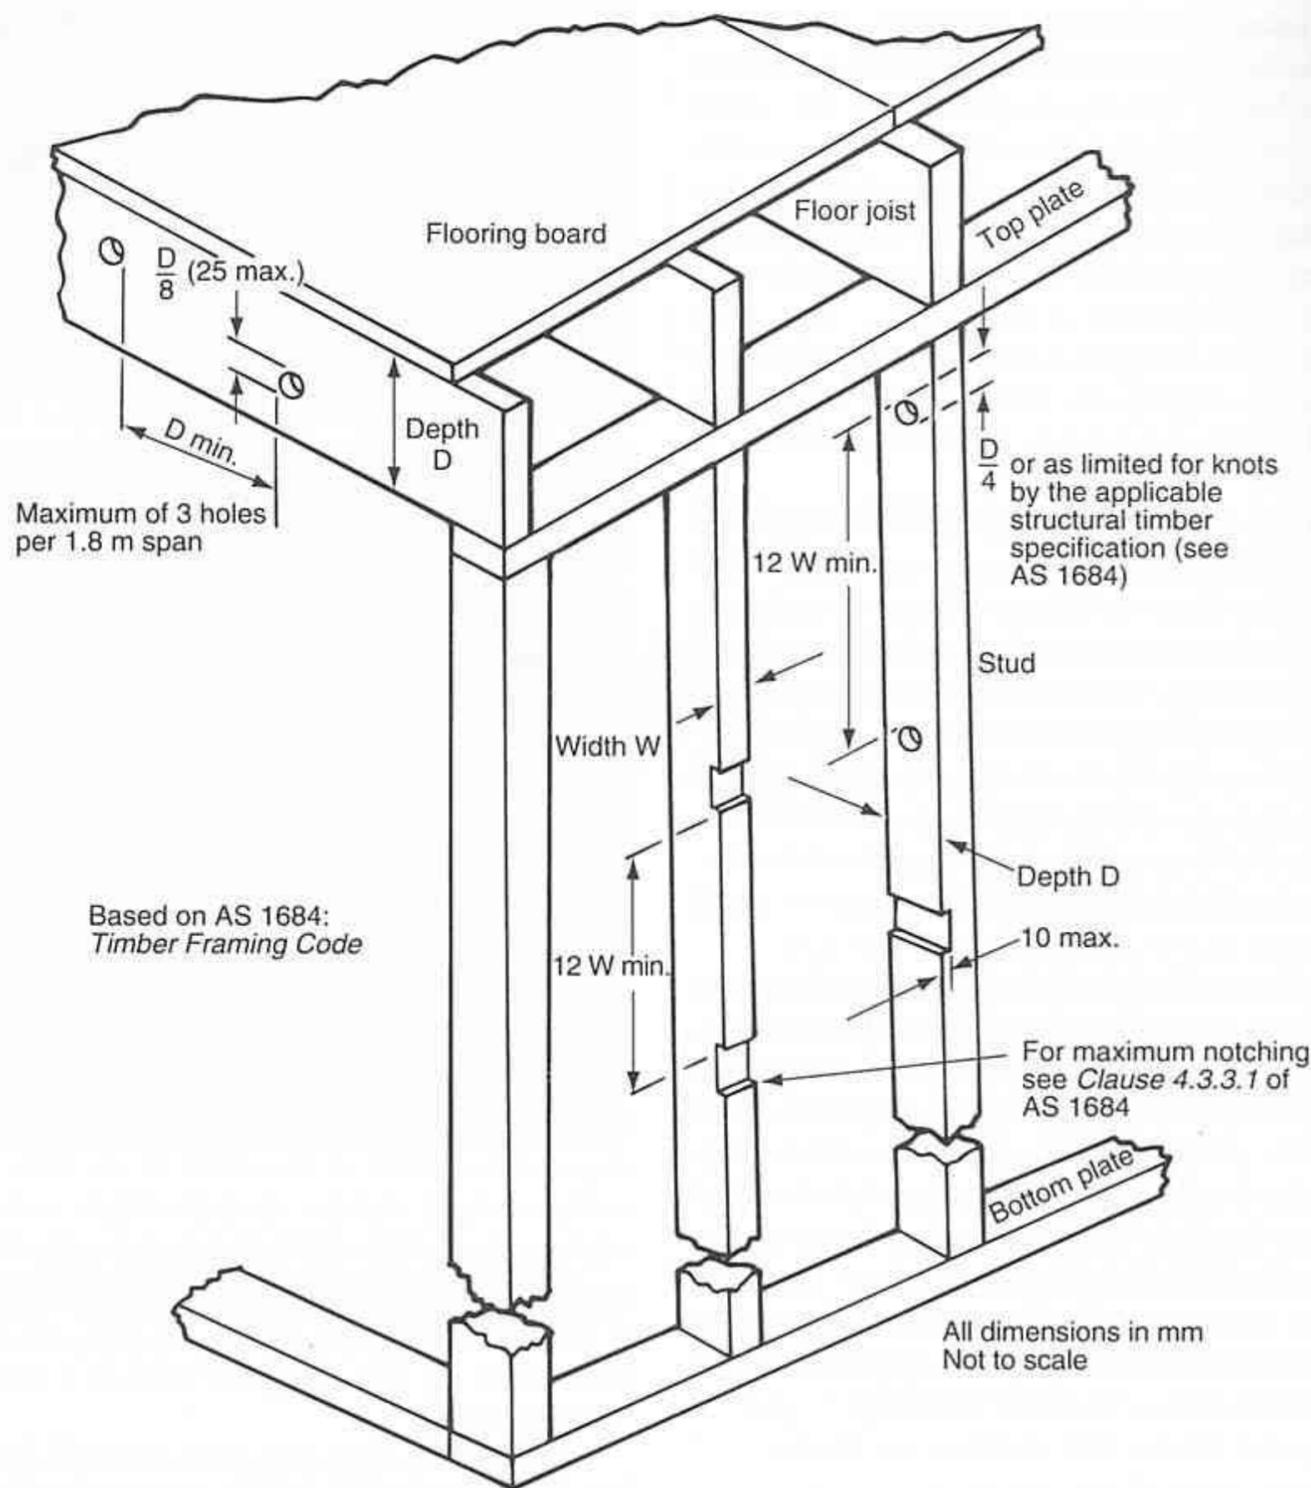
Notching and drilling studs, and drilling flooring joists and bearers
